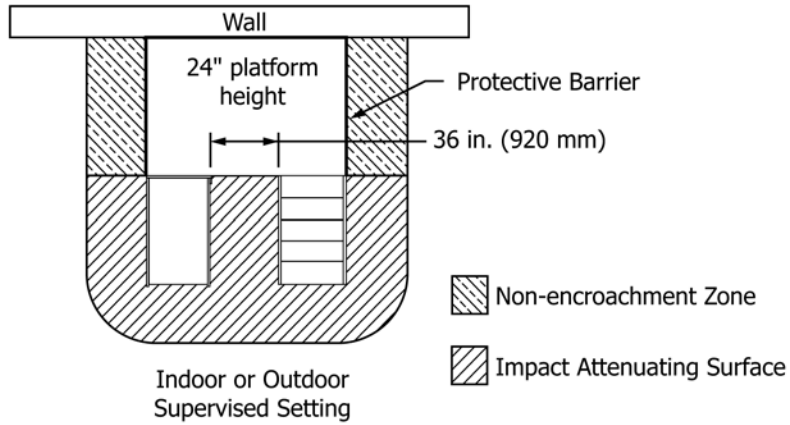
Play Structure Against a Wall in Indoor or Outdoor Supervised Settings
